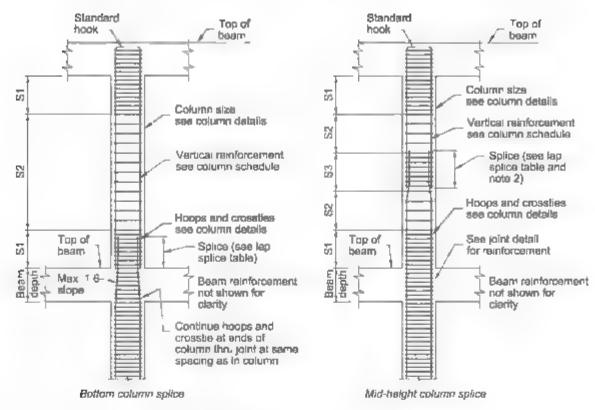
Column splice locations (Fanella 2007)
